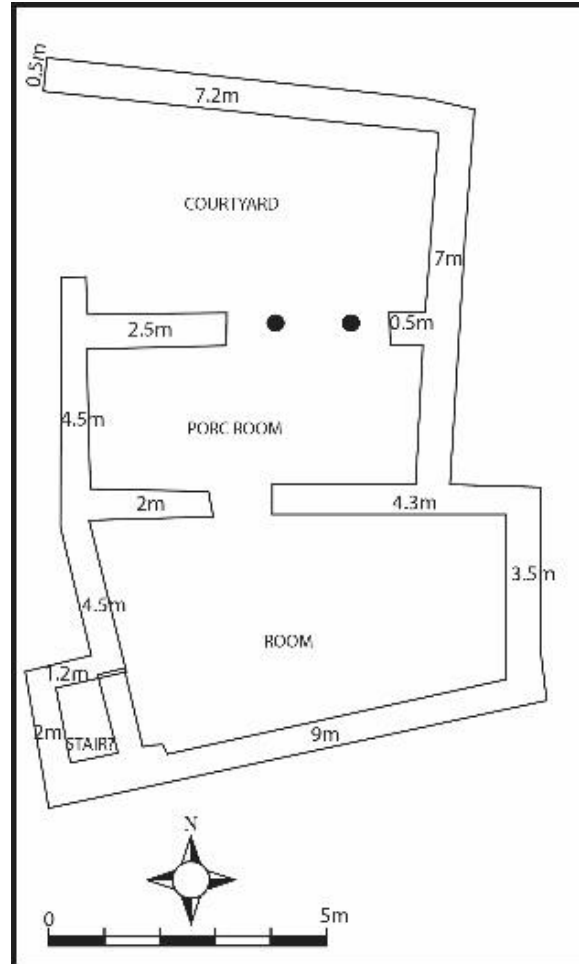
Wall Size of West House from Area A (Illustrated by M. Çarkı)
